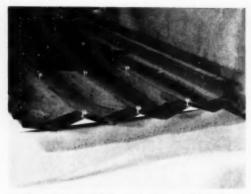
THE FLUTING of the sheets was designed to combat expansion and contraction. Note twisted brass studs. They were attached before the concrete was poured to assure good adhesion
